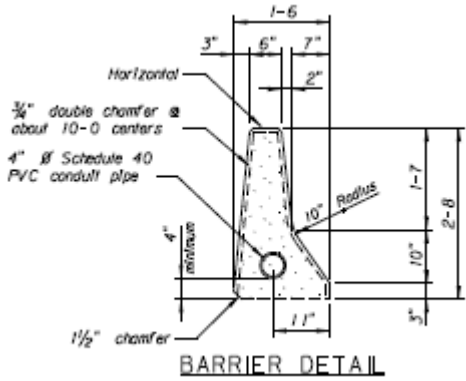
Concrete Barrier Rail: Code 'I'
